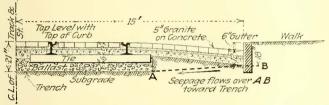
HOW A TRACK TRENCH MAY RECEIVE WATER FROM ADJACENT ROADWAY
